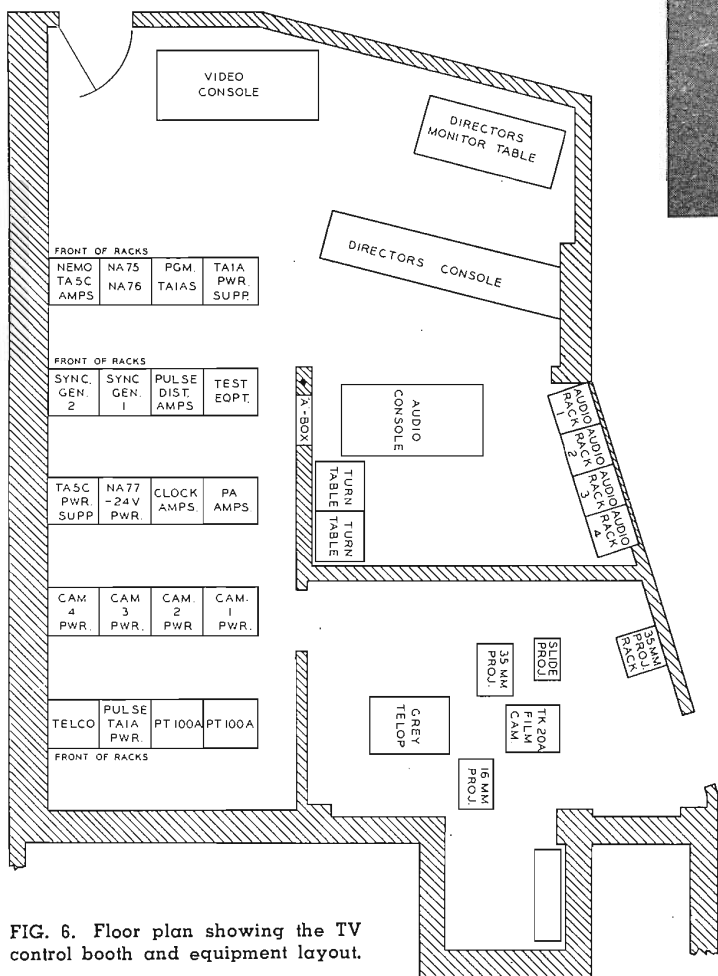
Floor plan showing the TV control booth and equipment layout.
